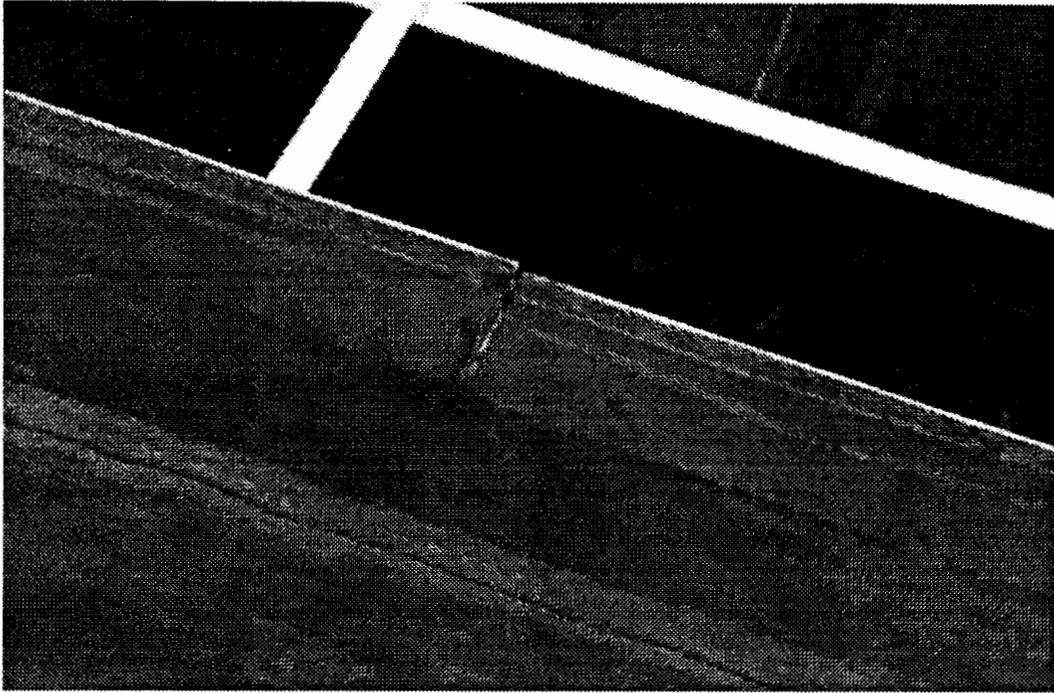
Roof tear on West side of USAR Center above entrance to drill hall.
